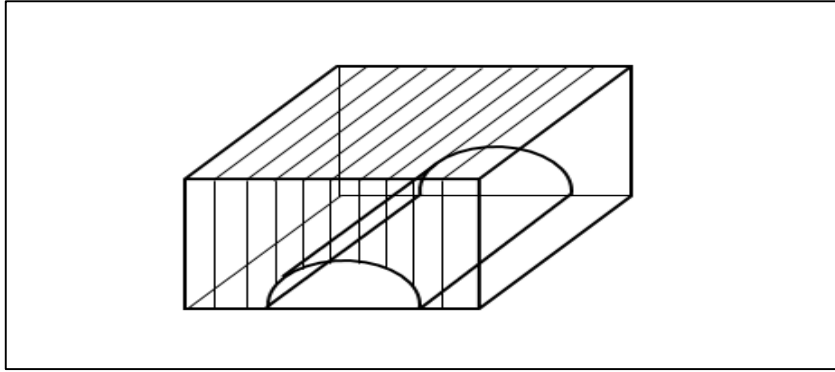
Joint strike parallel to tunnel. Dip 90°; Stress failure at 2.68×10^6 N/m²
